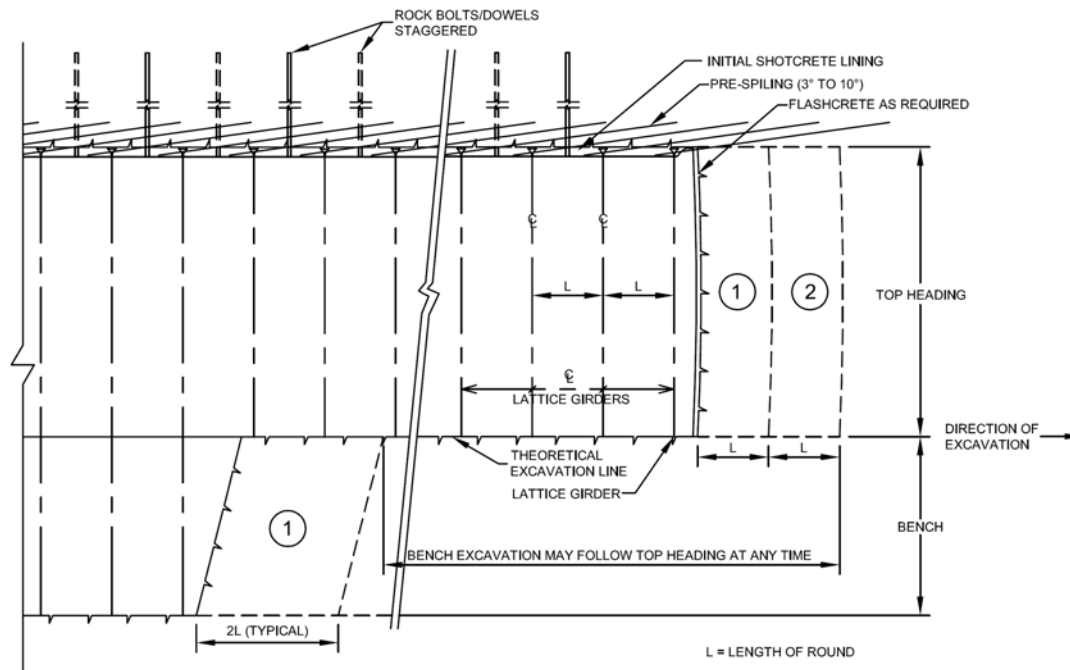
Prototypical Longitudinal Excavation and Support Class (ESC)
